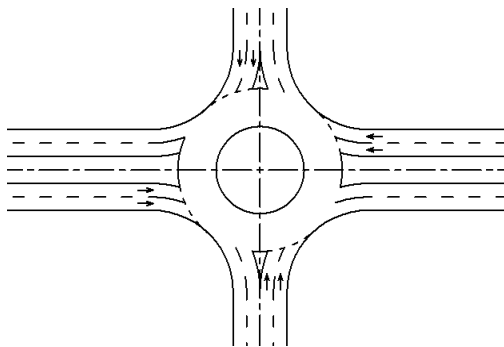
No.1 Intersection Proposed in Dinh Vu - Cat Hai Economic Zone Master Plan
